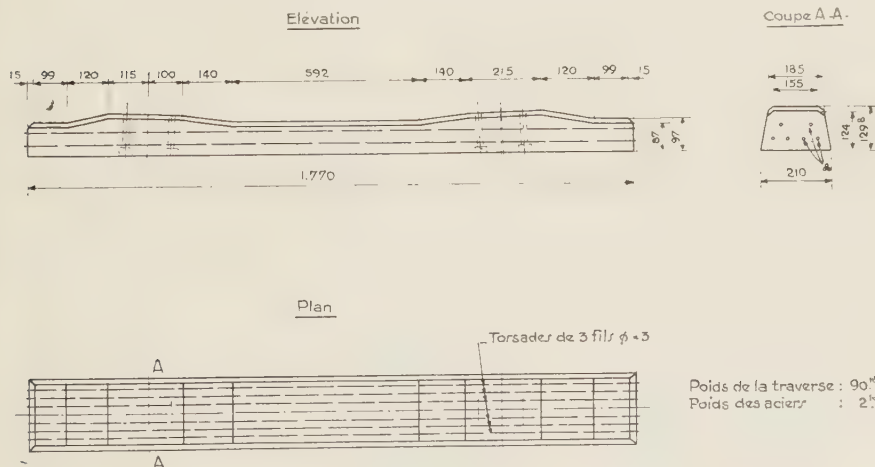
French West African Railways*. STUP prestressed concrete sleeper for metre gauge track.
